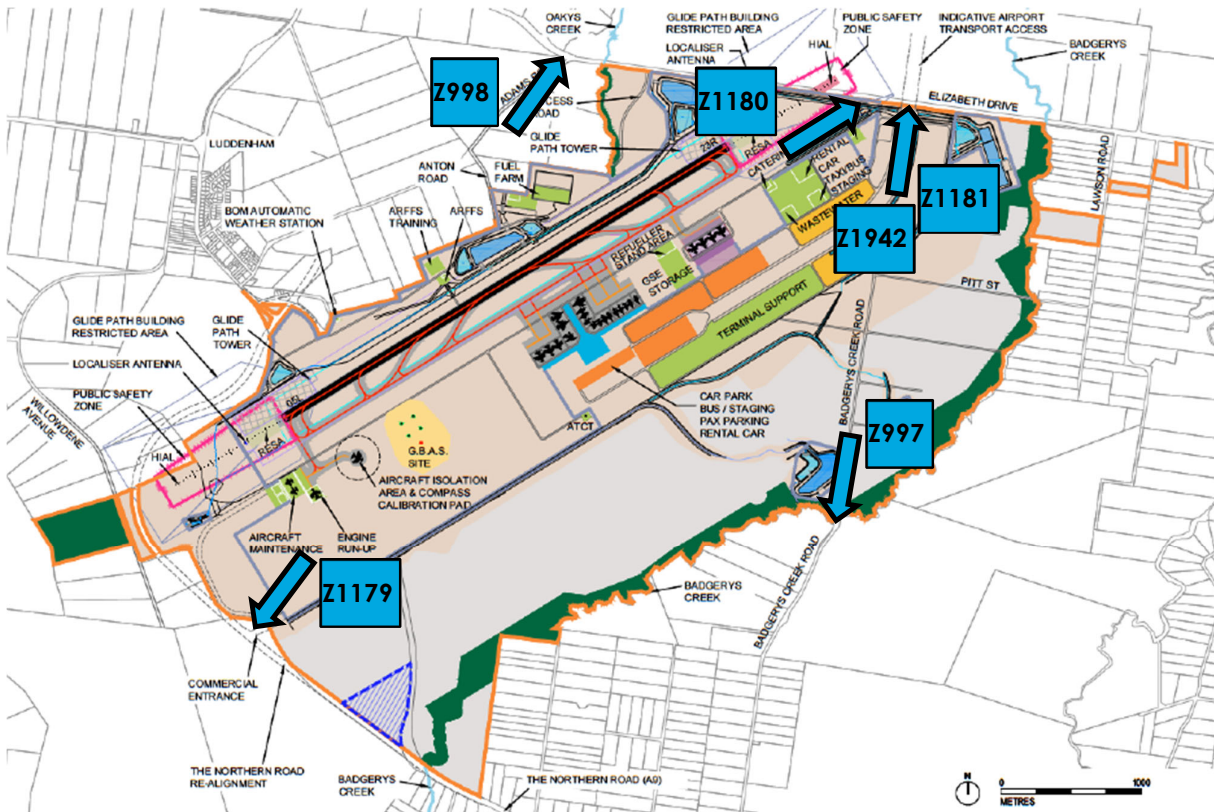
Stage 1 Airport Site Layout and Model Zone Loading Locations
